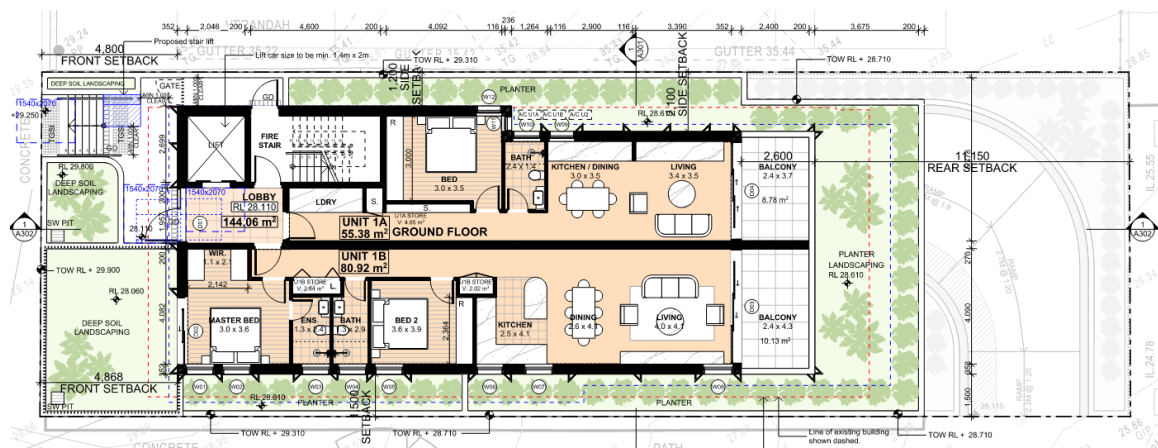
Proposed ground floor plan (Source: Arkhaus)
